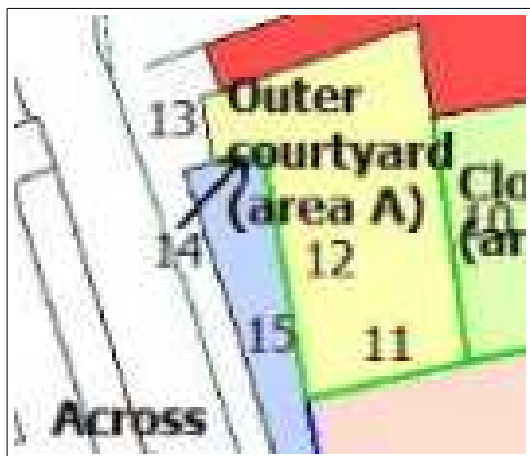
Wall 12/15, on the west side of the farmhouse garden, against the overgrown verge of the lane, from the junction with wall 11 to that of wall 14.
